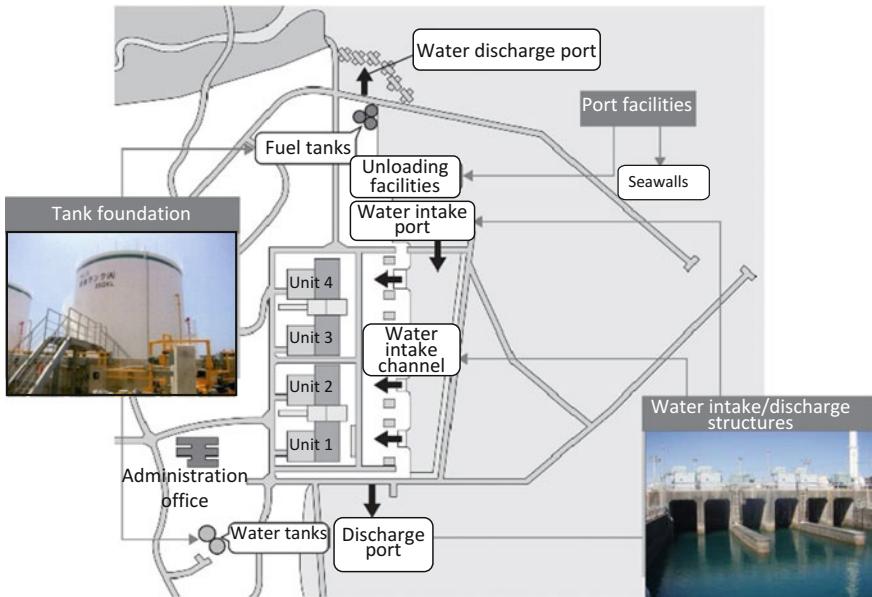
Layout of civil engineering structures at a nuclear power station [1]
